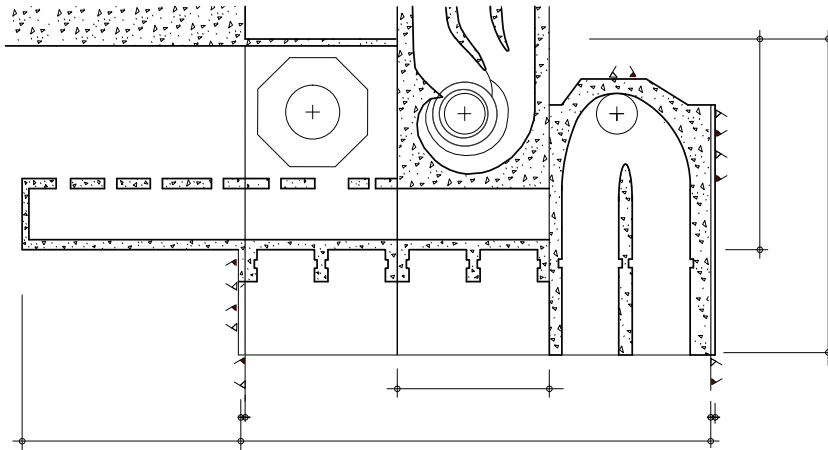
Plan of the powerhouse and assembly area – Kaplan turbine with semi-spiral casing made of concrete.
